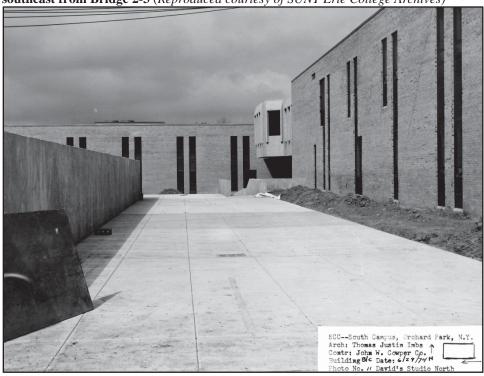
A June 29, 1974 view of the north side of the main court area under construction looking west toward Building 3 (Reproduced courtesy of SUNY Erie College Archives).
